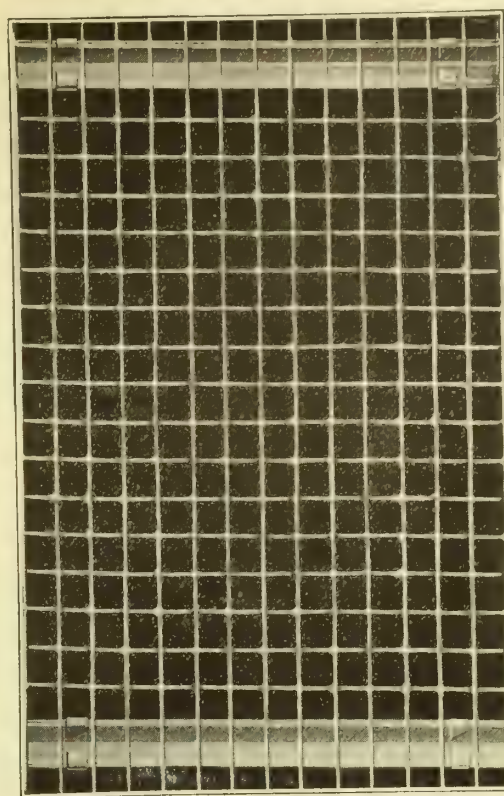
WRIGHT STIFFENED STEEL WIRE LATHING
